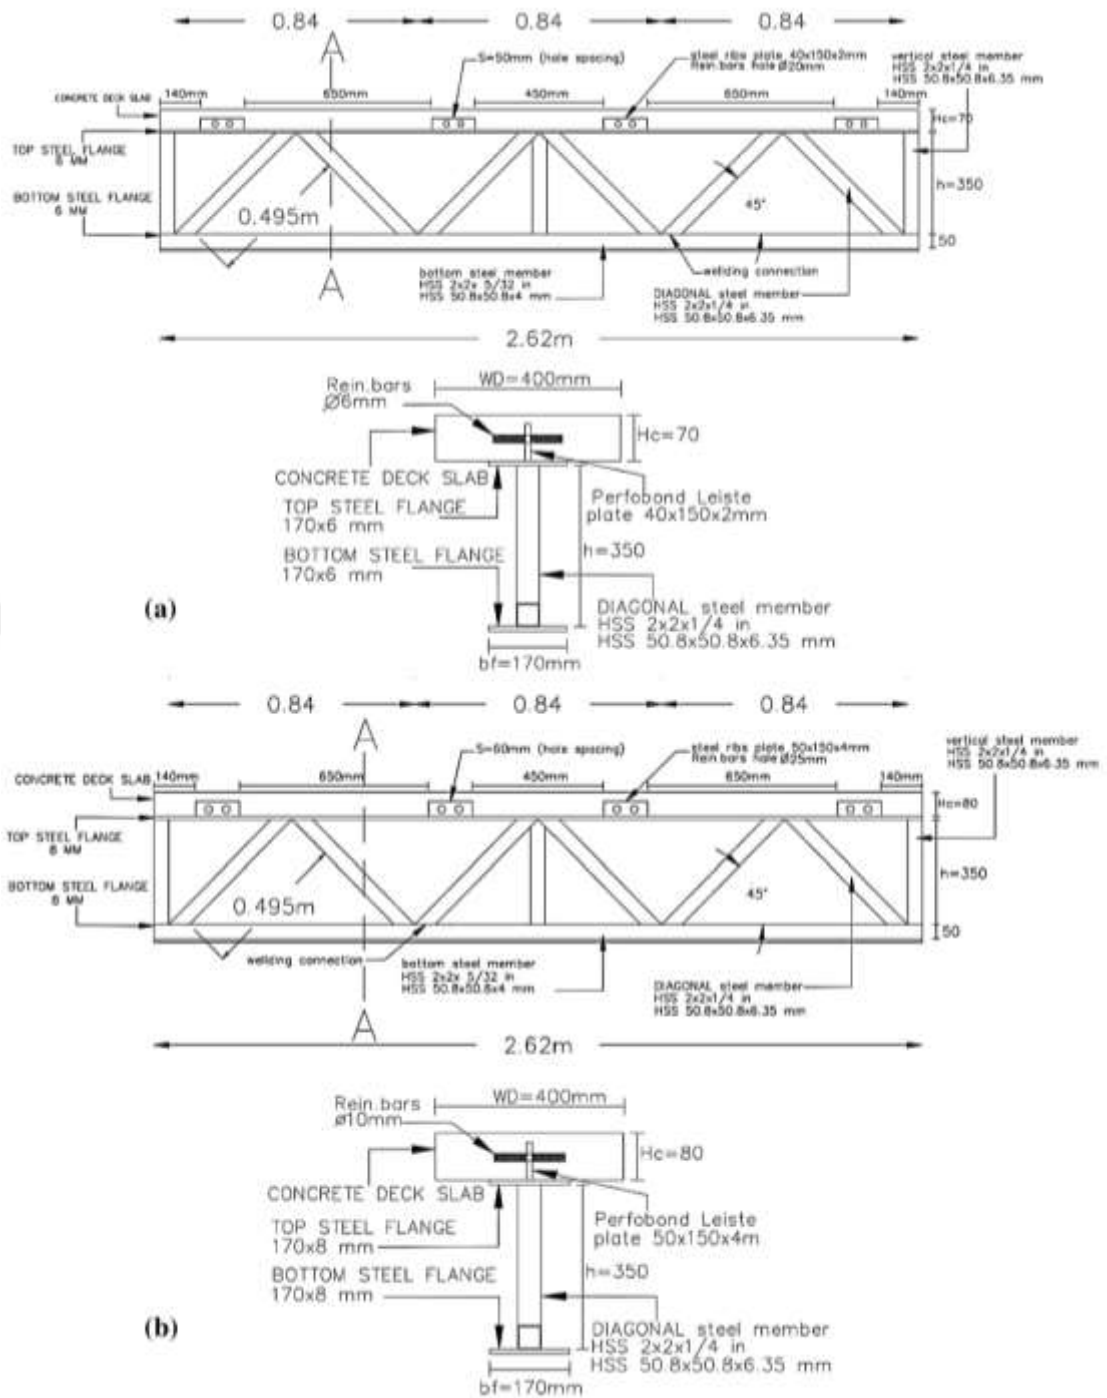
First Category Composite Truss Girder (SCTG) Models. (a) Layout of Specimen One (SCTG-1), (b) Layout of Specimen Two (SCTG-2).
